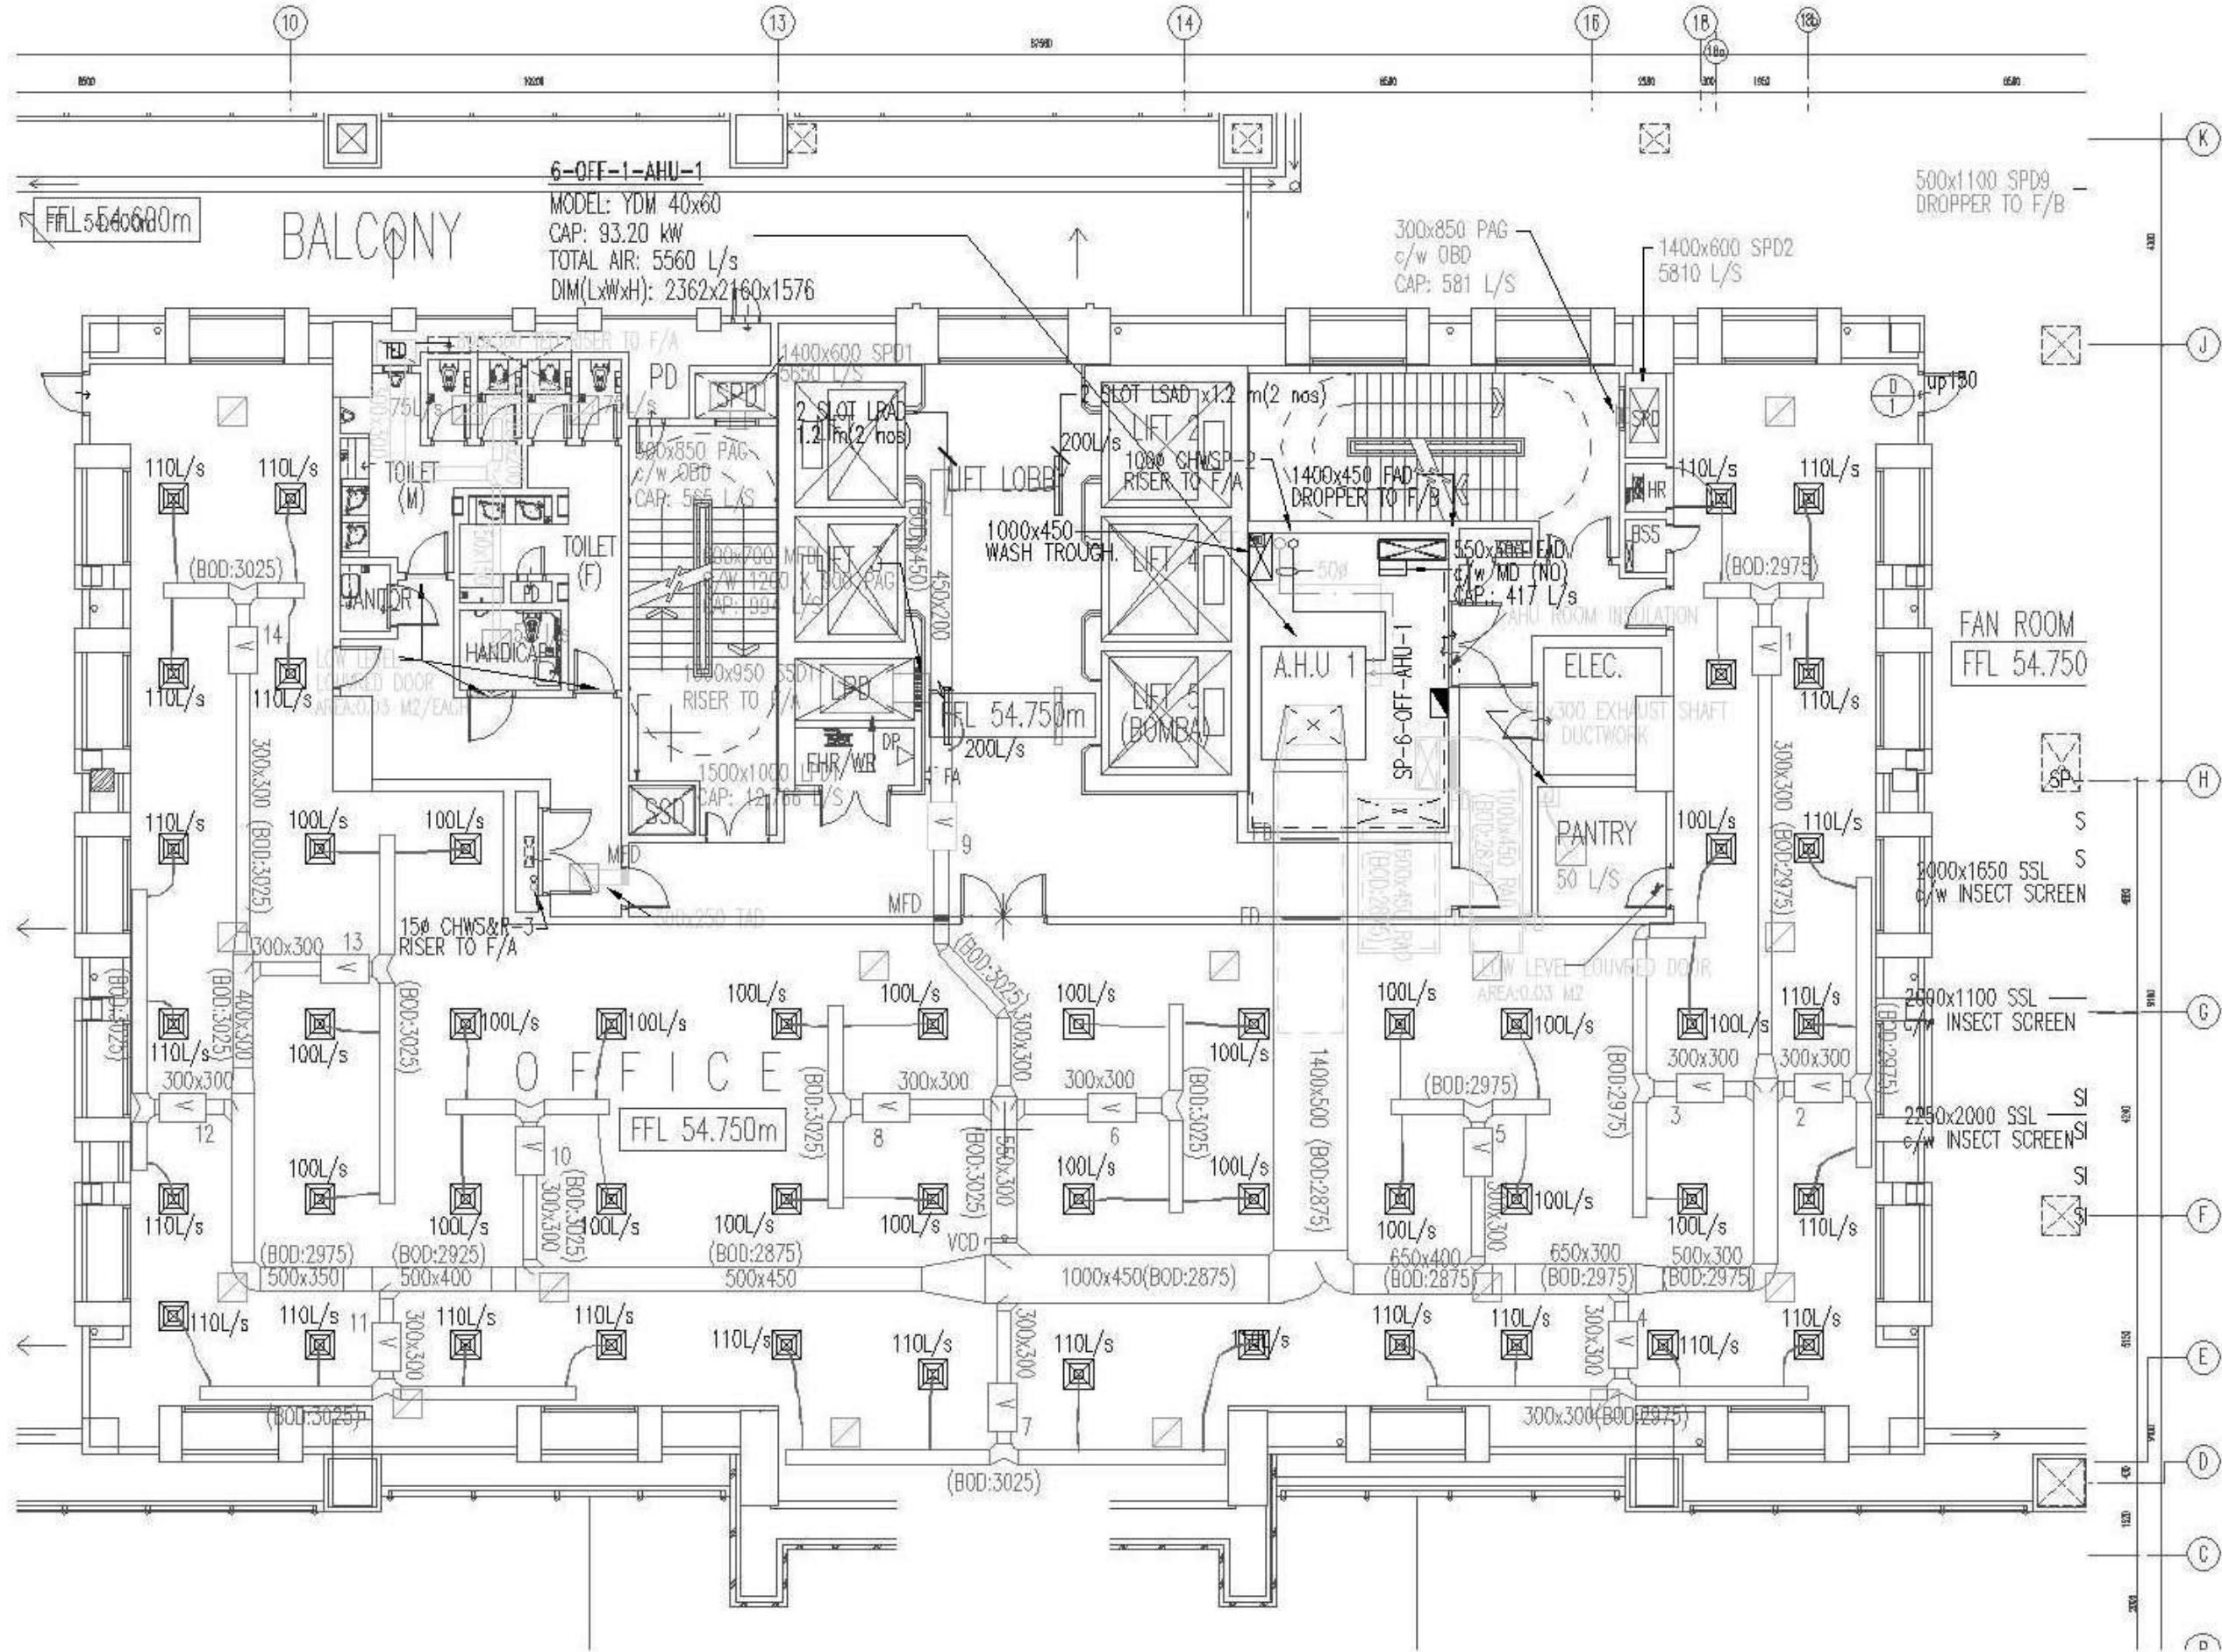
The floor plan of level 6, Legal Affairs Division Office (BHEUU)
